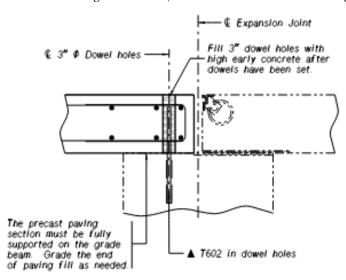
Connection of the precast concrete panel of the paving section to the grade beam (I-680/West Center Road Bridge)
